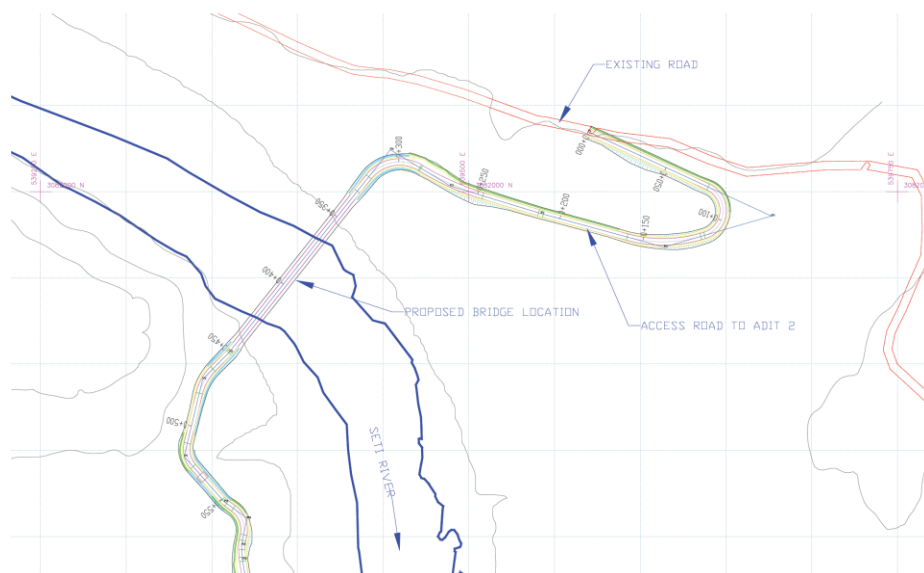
Proposed location of bridge at headworks site (Source: Detail Design Report, 2021)
